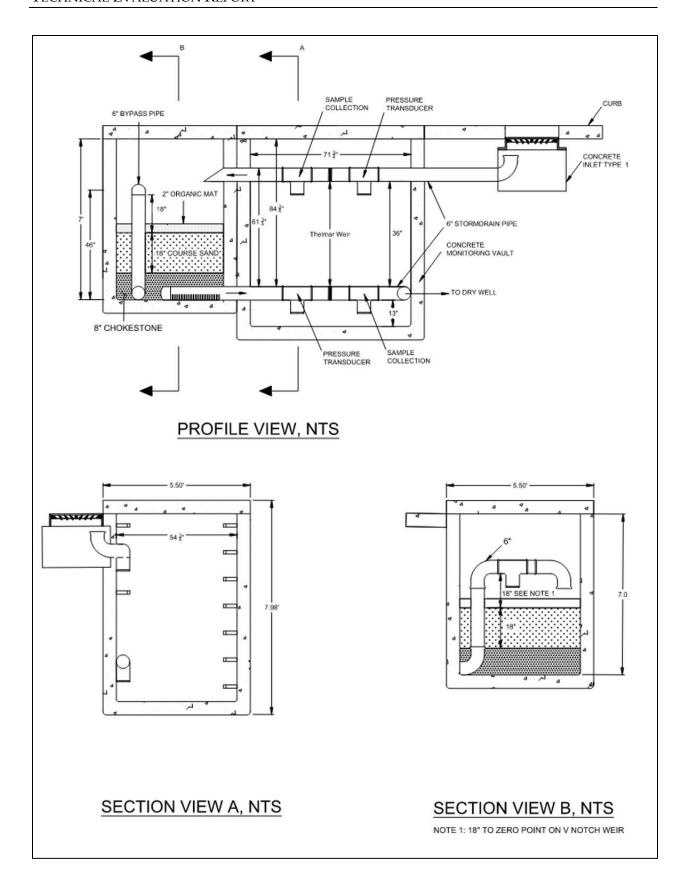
Cross Section of Sand Filter in Sidewalk Vault Design
